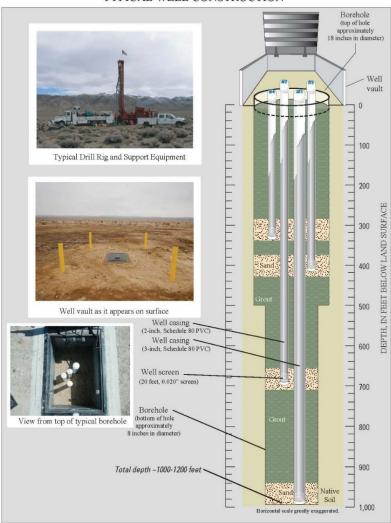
Construction diagram of a typical multiple-well monitoring site.
